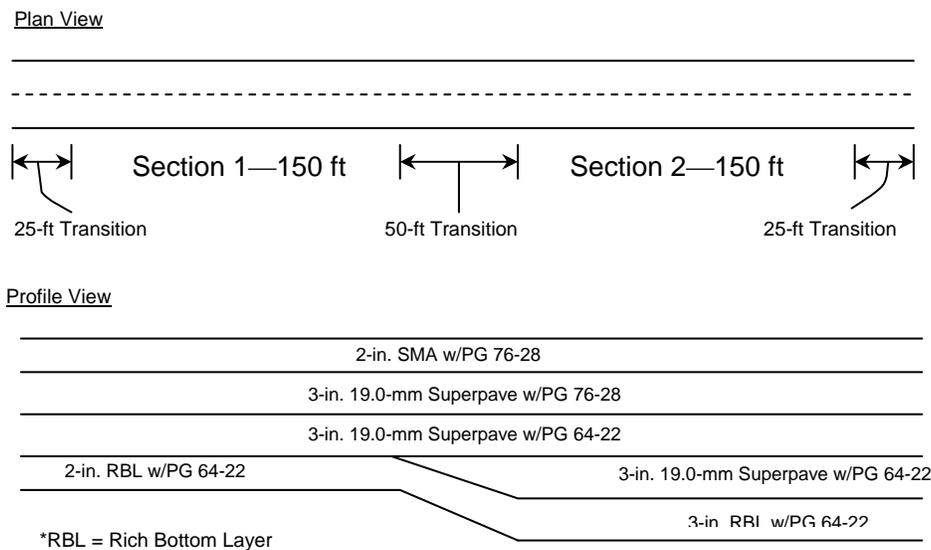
ODOT’s structural test sections at NCAT test track.
